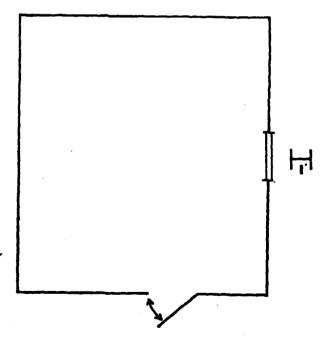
Cunningham outbuilding. Plan of Cellar House.
